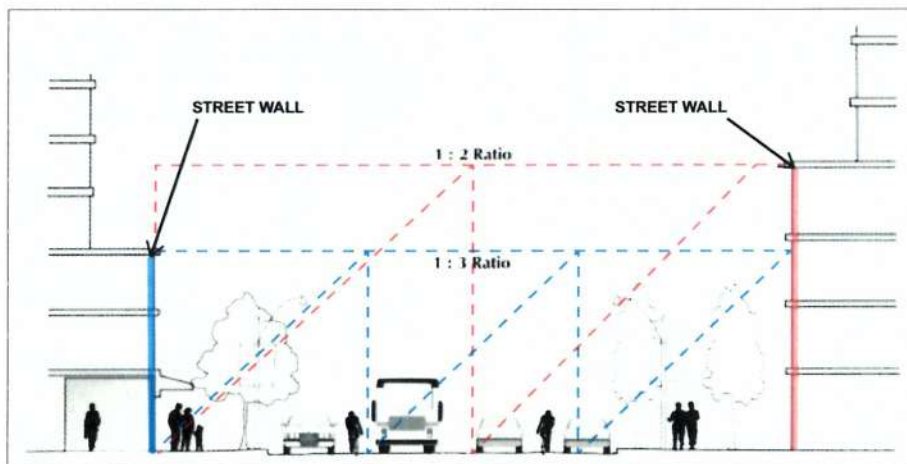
A building height-to-street-width ratio of between approximately 1:3 and 1:2 is recommended to frame streets and provide human scale. Portions of buildings above the street wall are encouraged to step back.
